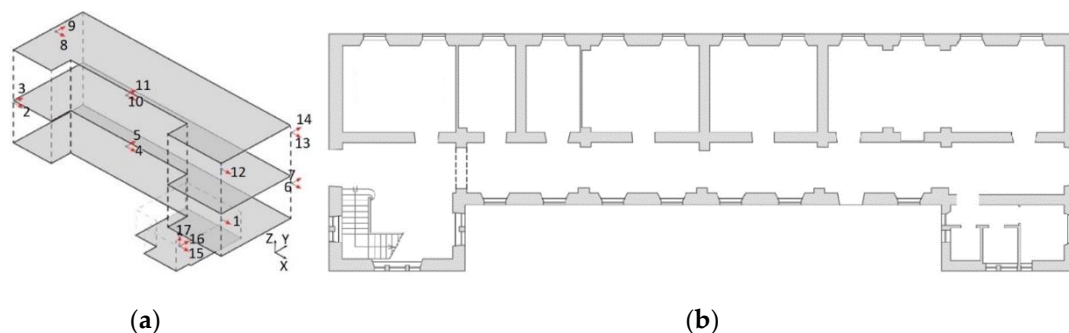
Building schematization: (a) floors schematization with sensors location; (b) plan.
